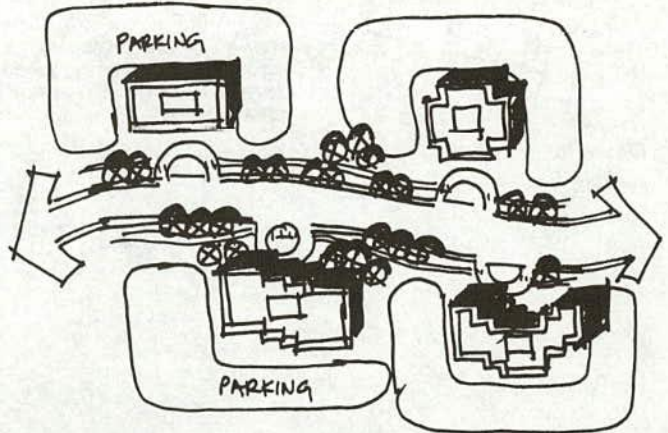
Typical design concept in which buildings are oriented along streets with sidewalks.
